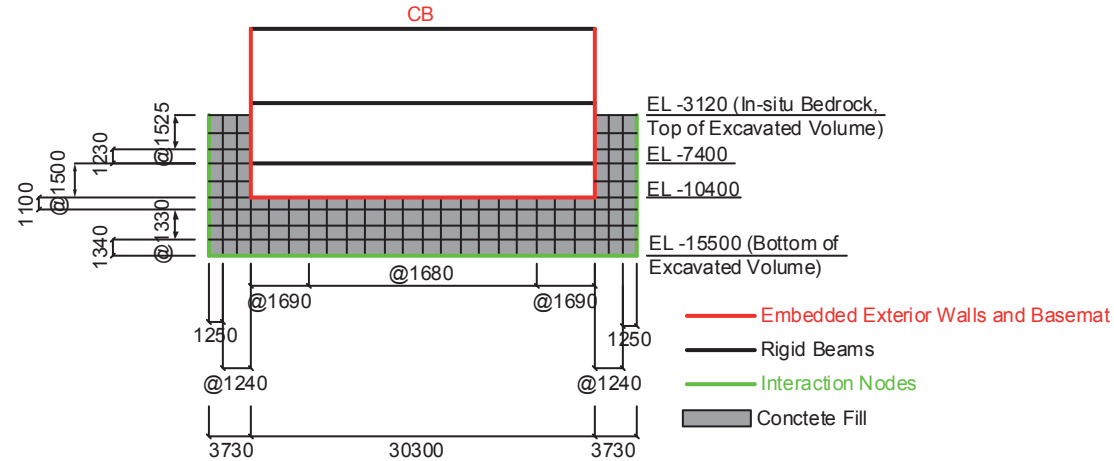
(d) Elevation B-B' Excavated Volume Model (PE)
